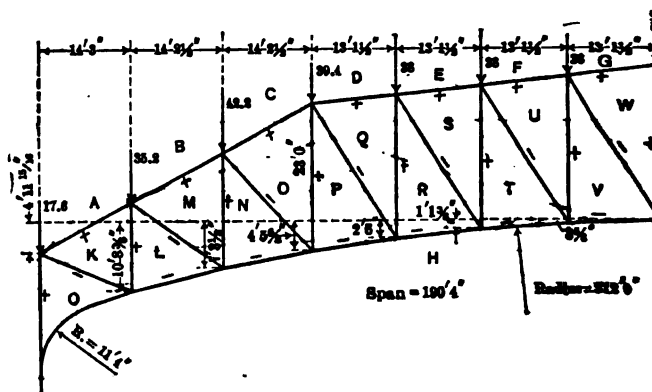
Pin-connected Truss Over Drill-hall, 71st Regiment Armory, New York City
